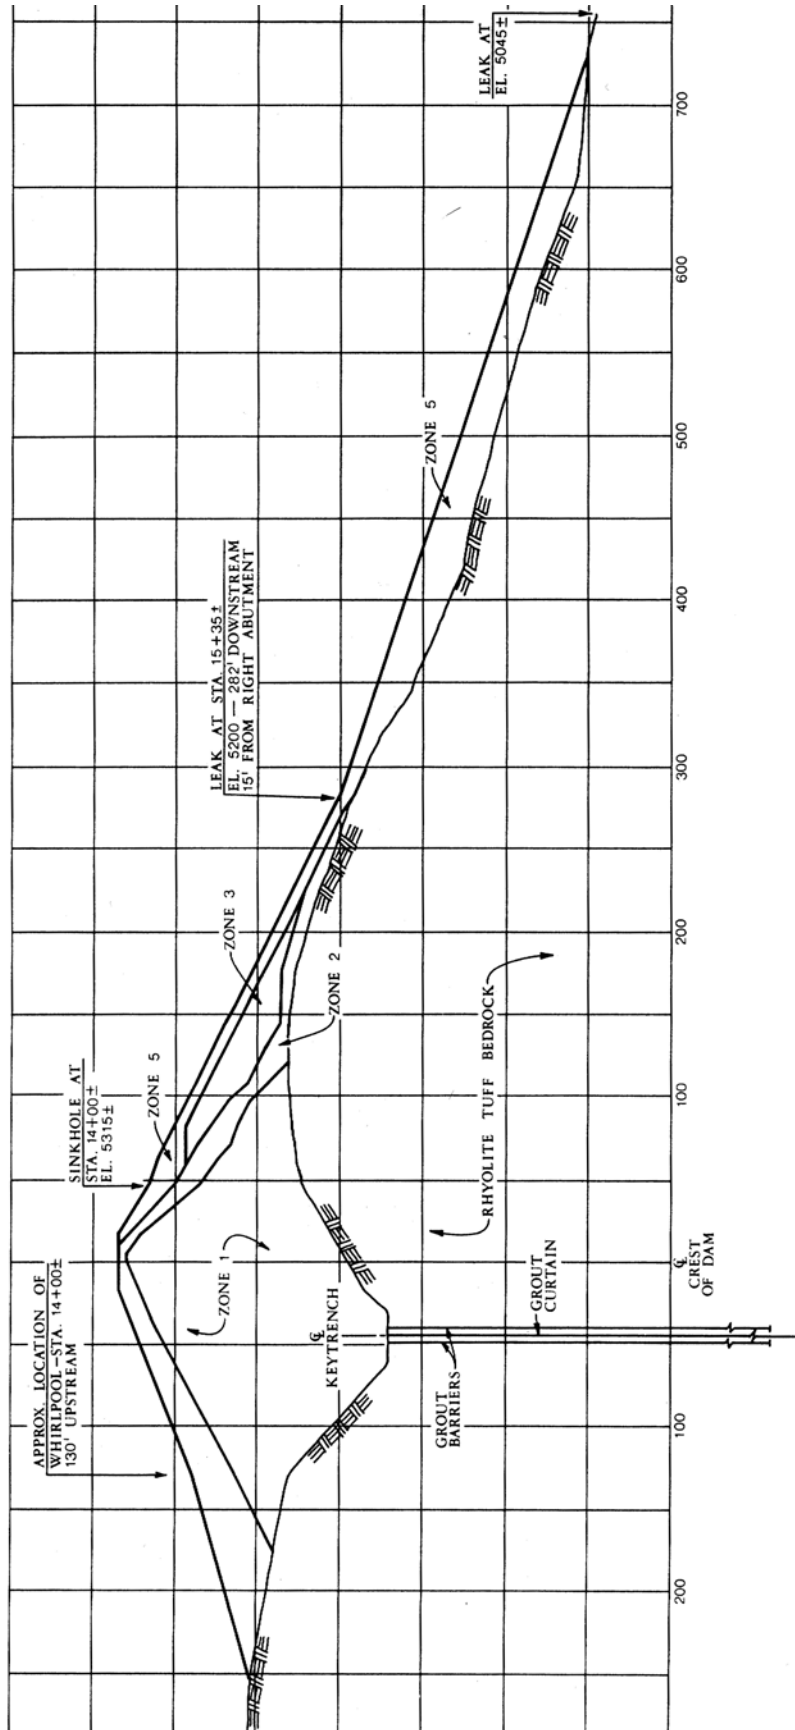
Cross section of the dam at the right abutment (IP, 1976)
